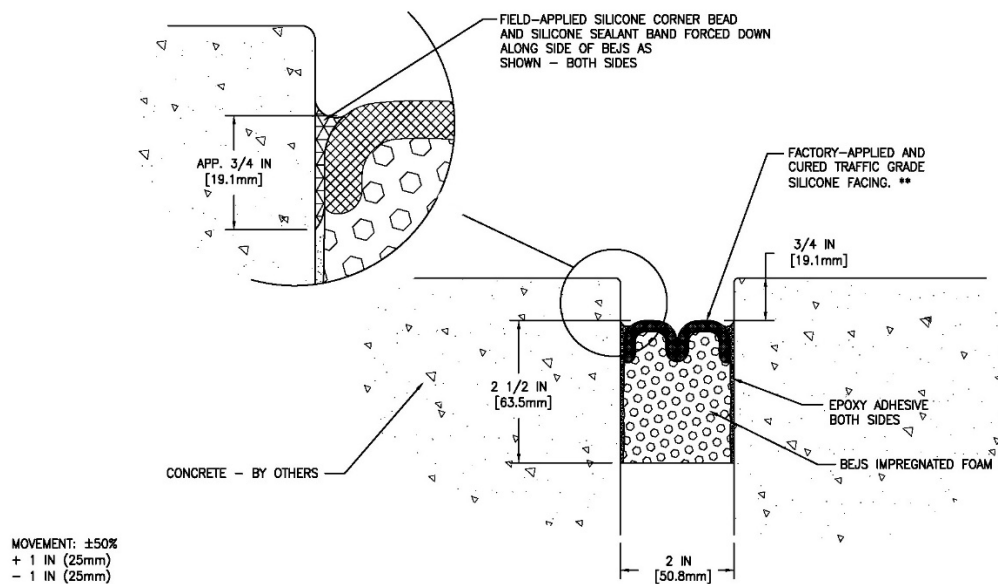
Precompressed, self-expanding open cell foam bonded joint seal
